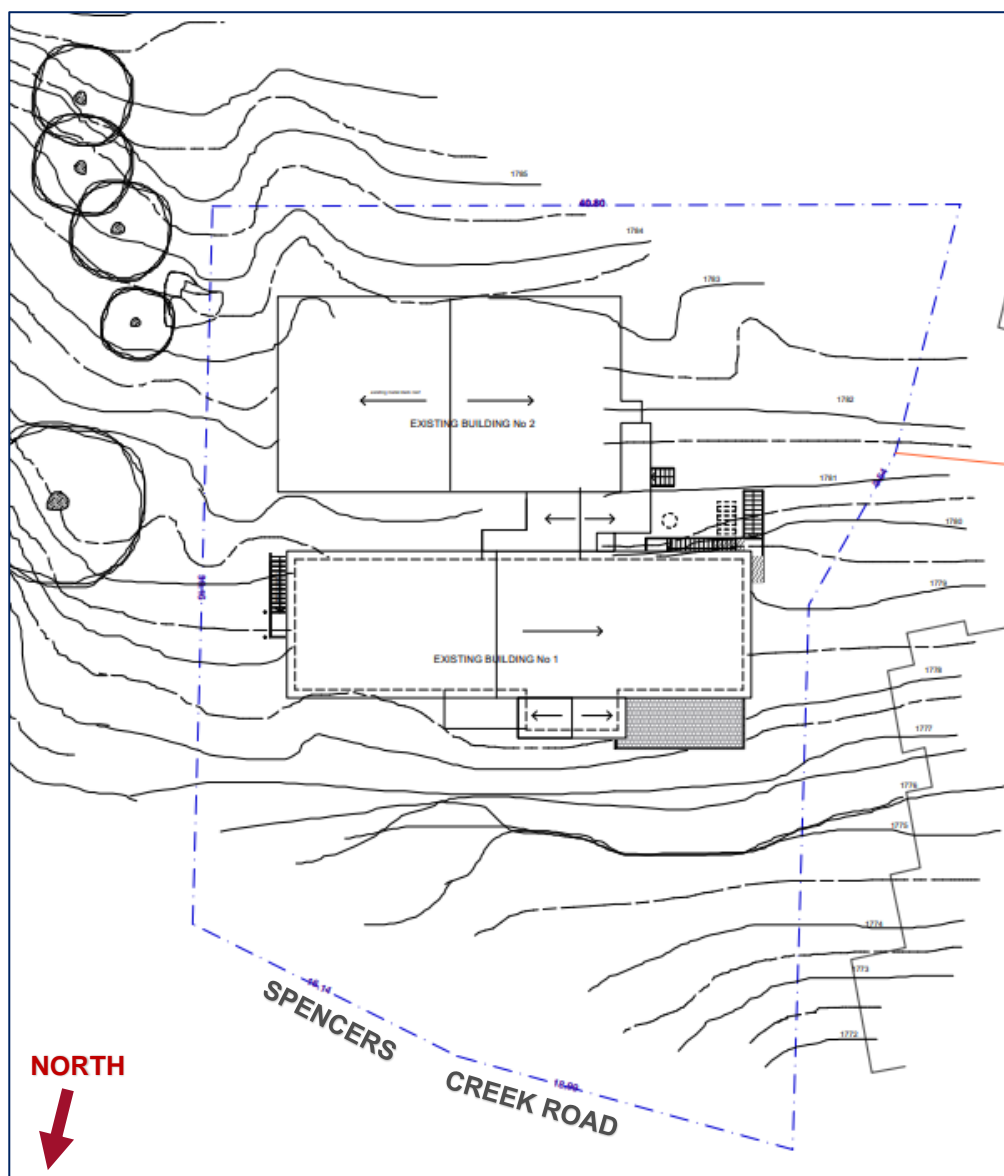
| Site Plan Southern Alps Ski Lodge – (Source: Applicant's documentation, with annotations)
